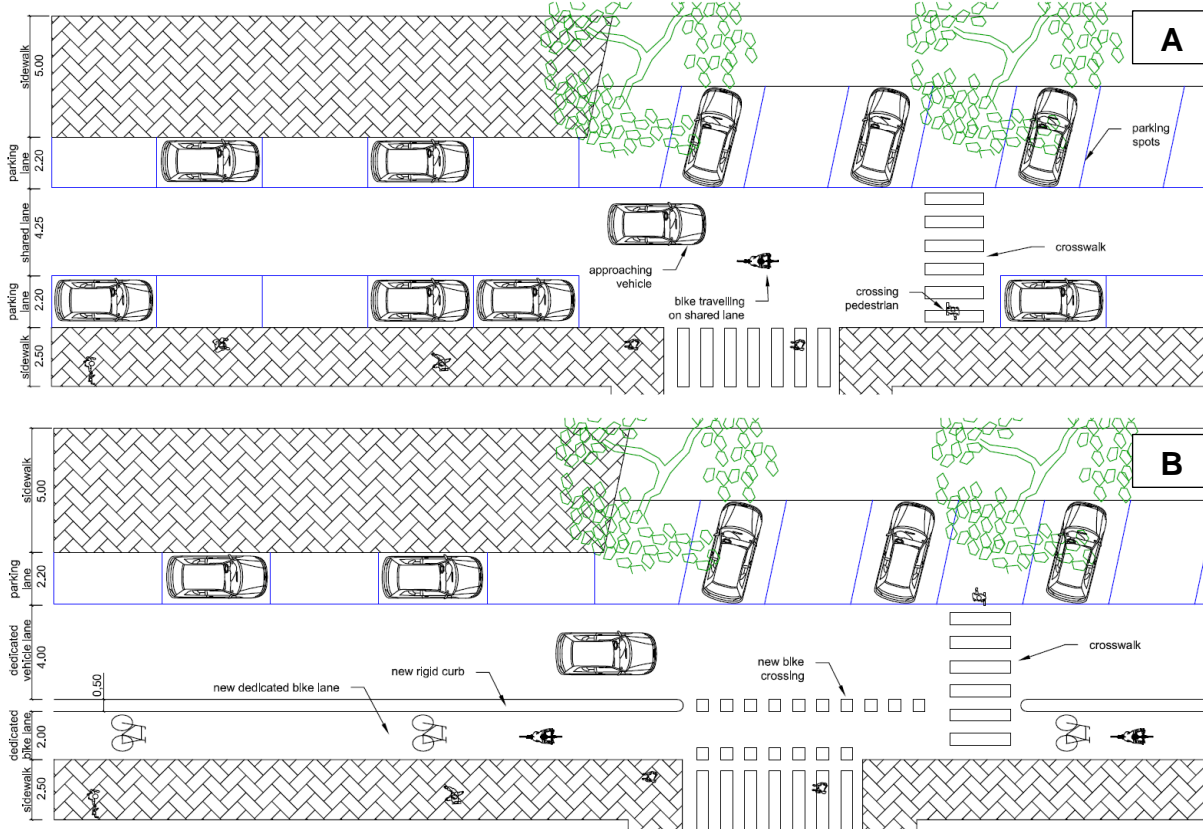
Segment between the intersection *Corso Re Umberto* and *Via Sacchi*: (A) actual layout with shared lane, (B) proposed layout with dedicated bike lane with curb introduction.
